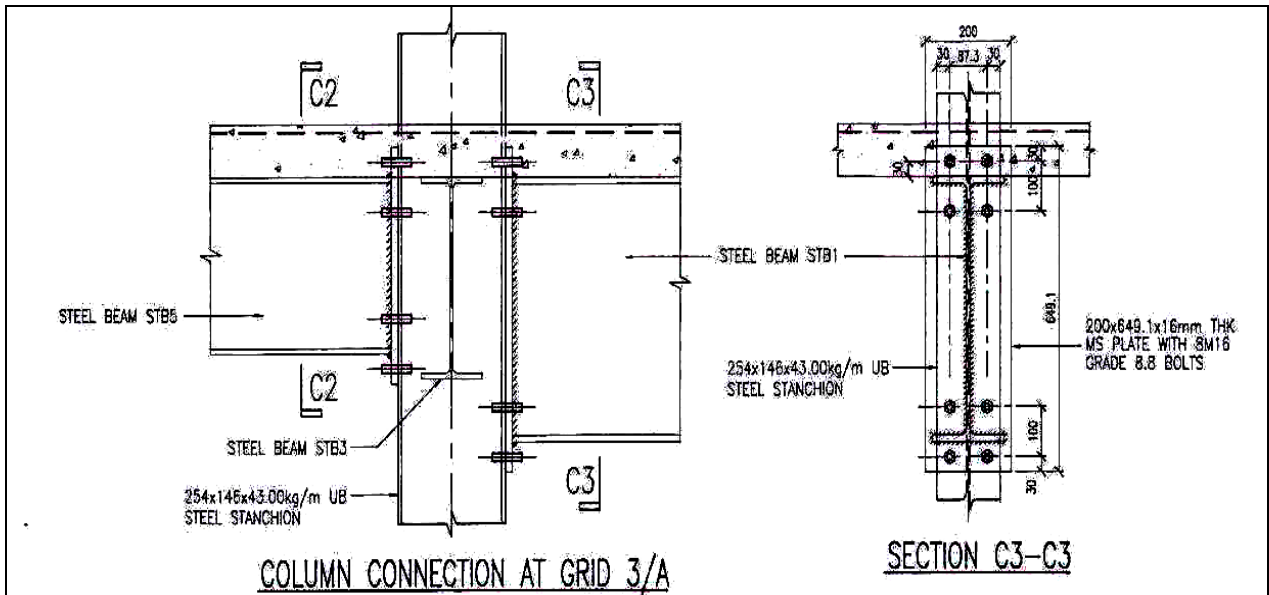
Connection details 2 (details and sizes shown are indicative only)
